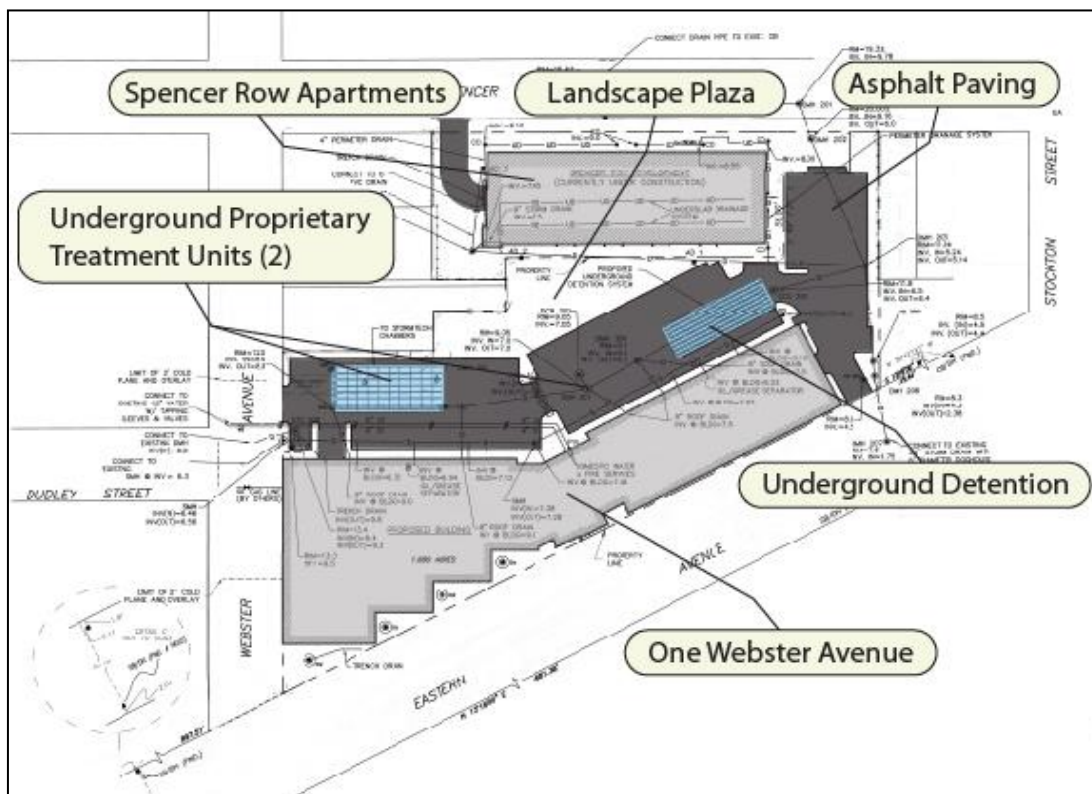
Existing Approved Plan View for One Webster Avenue and Spencer Row
